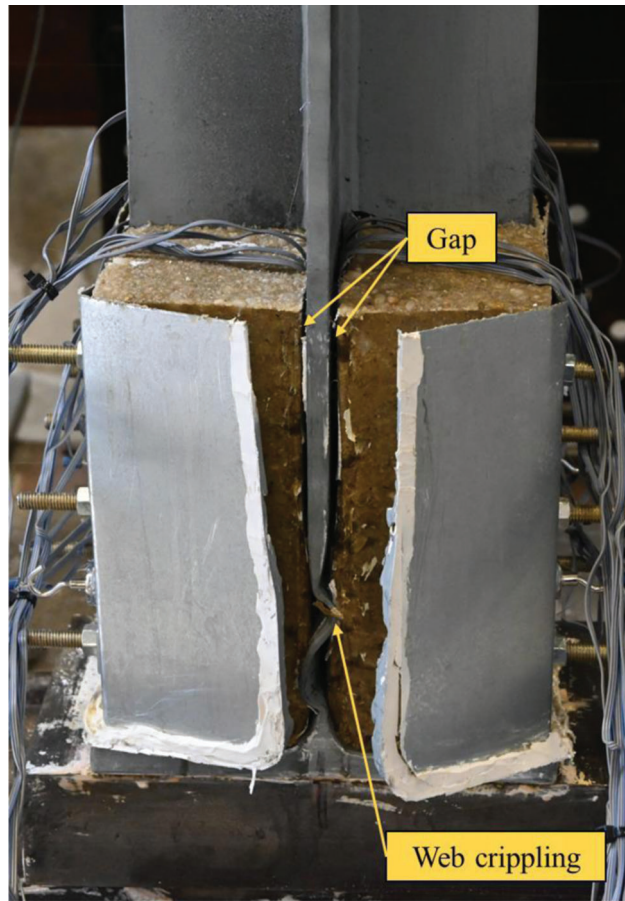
Specimen 7: deformed shape, enlarged front view.
